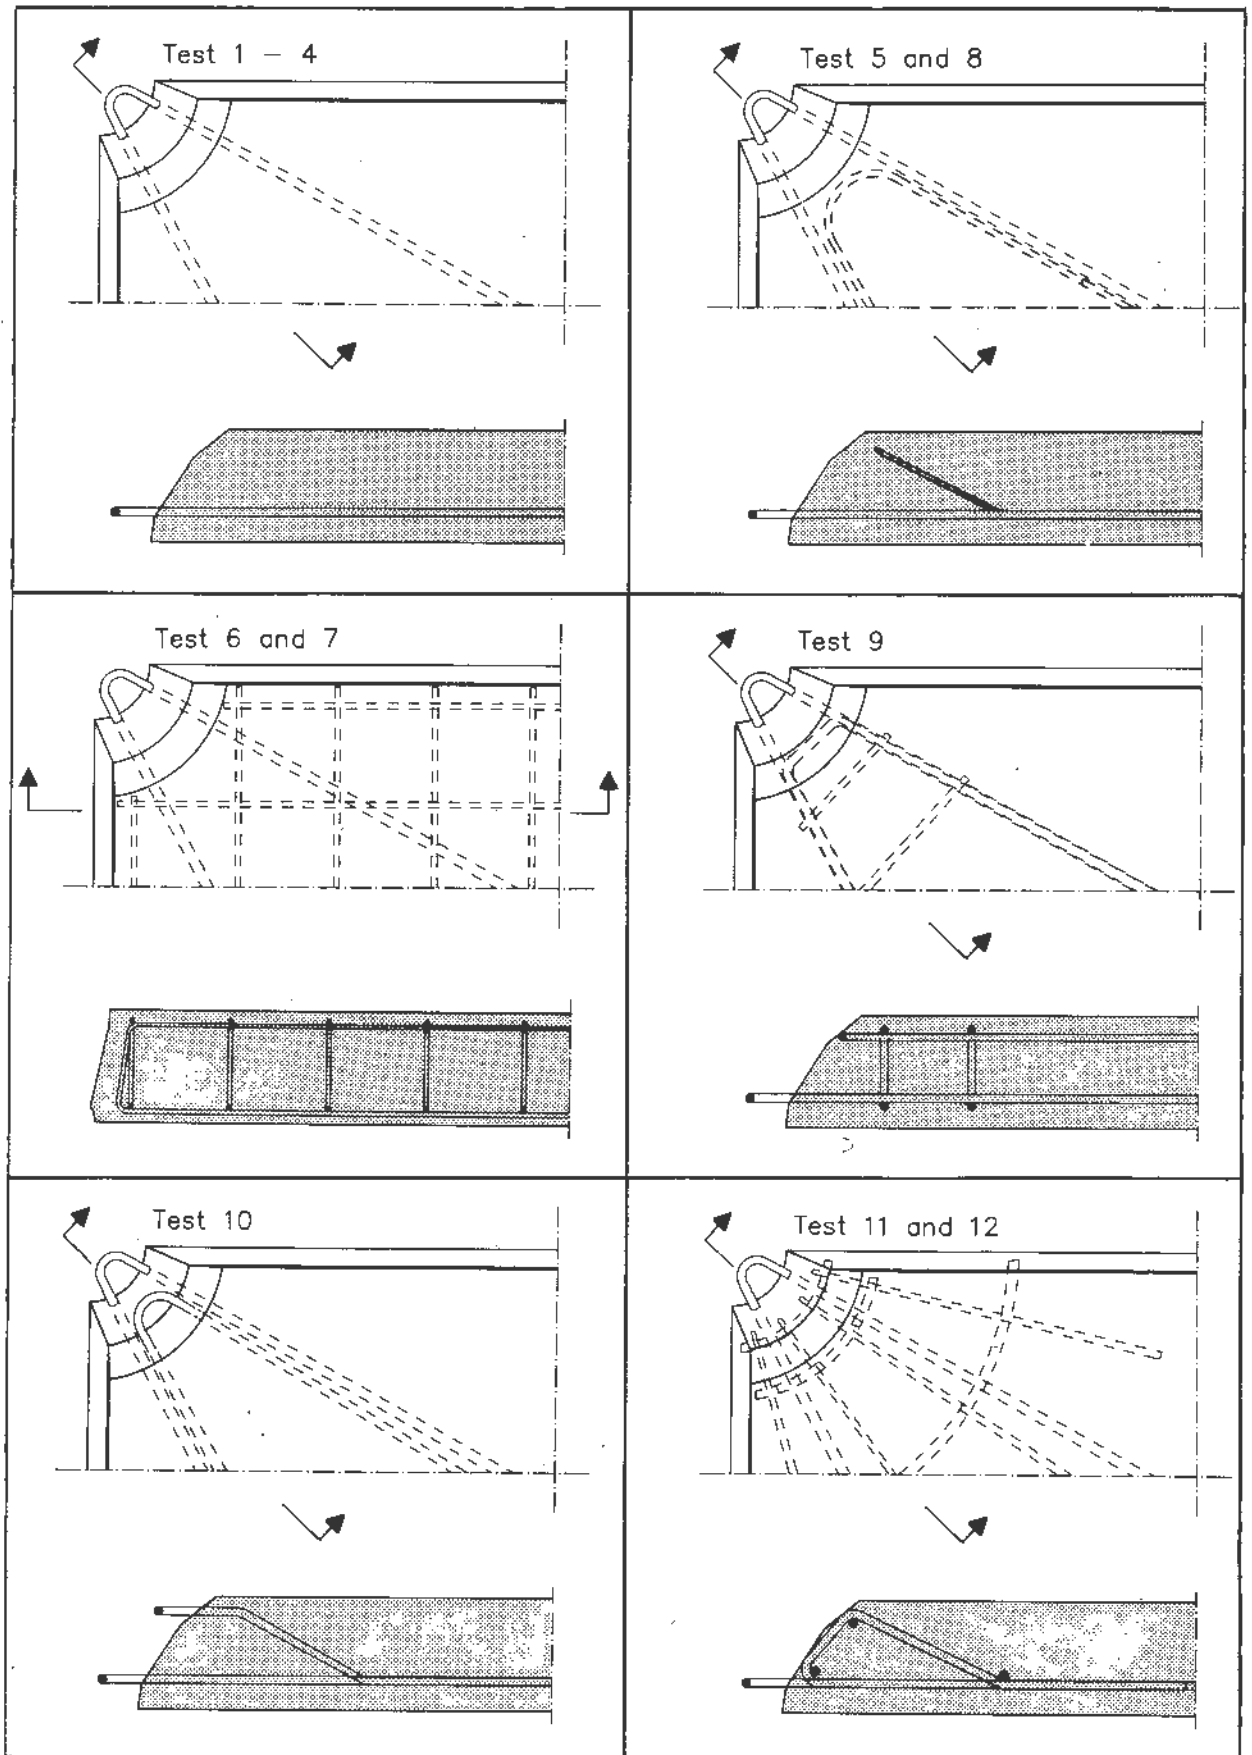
Reinforcement arrangements in the slab corners. The ordinary mesh reinforcement is not shown.
